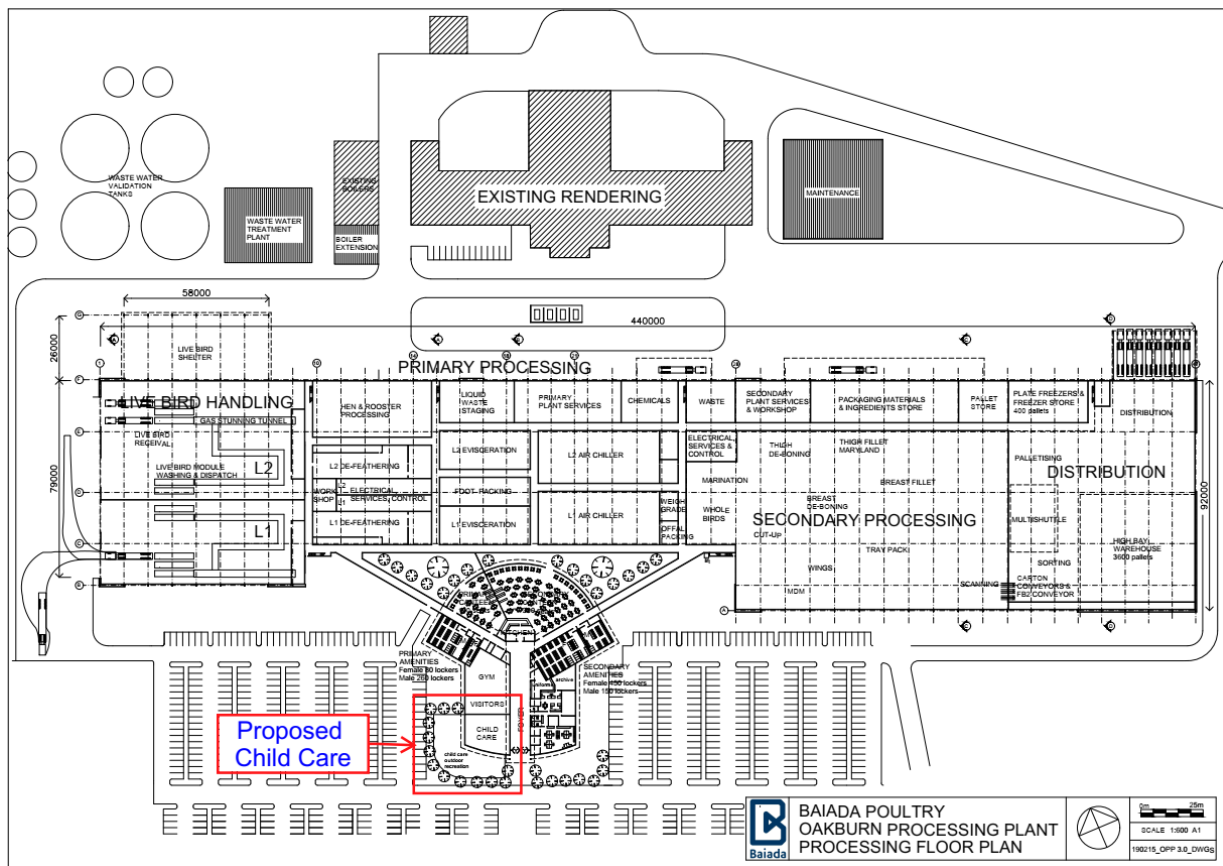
Proposed PPF Floor Plan (dwg no.: 190215\_OPP\_3.0\_DWGS)
